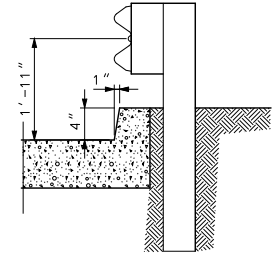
DETAIL FOR TRANSITIONING BETWEEN TYPE A AND TYPE B GUARDRAIL
